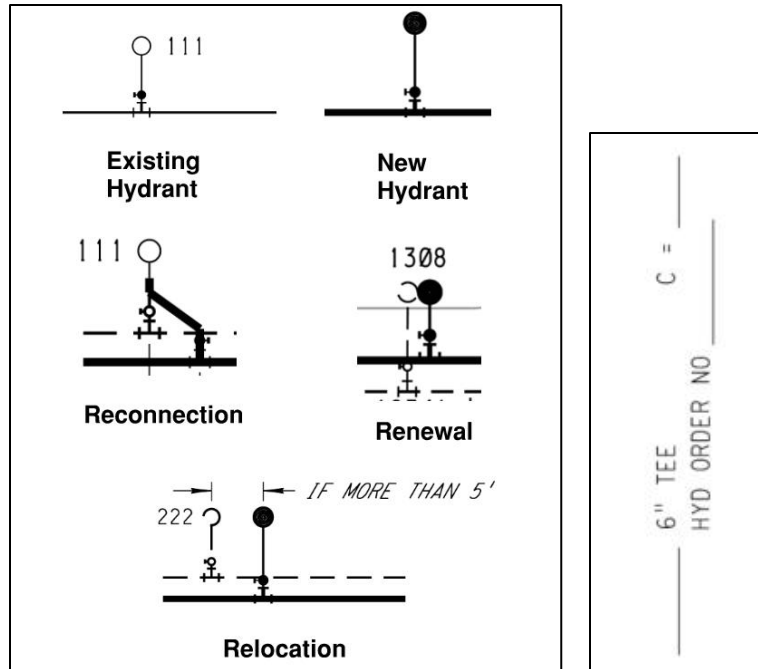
Hydrants on Plan Sheets and Station Note Example
